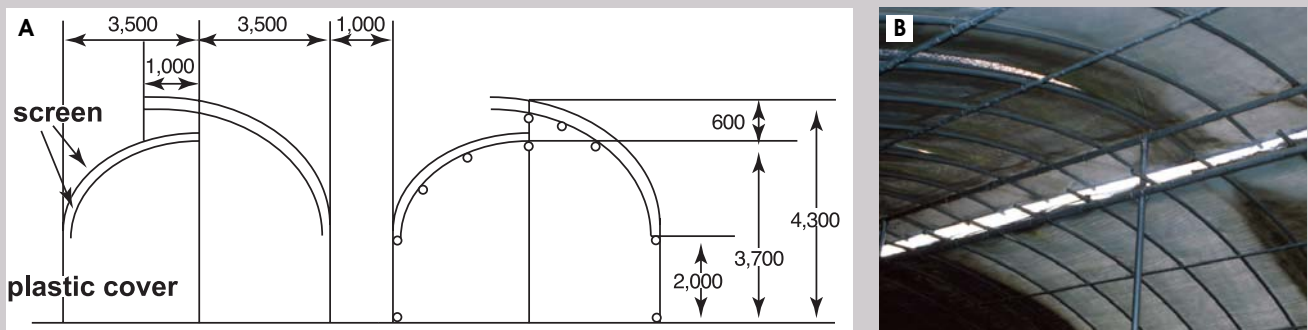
Overlapping open roof house A: A plan of overlapping open roof house B: The overlapping open roof seen from inside growing house
